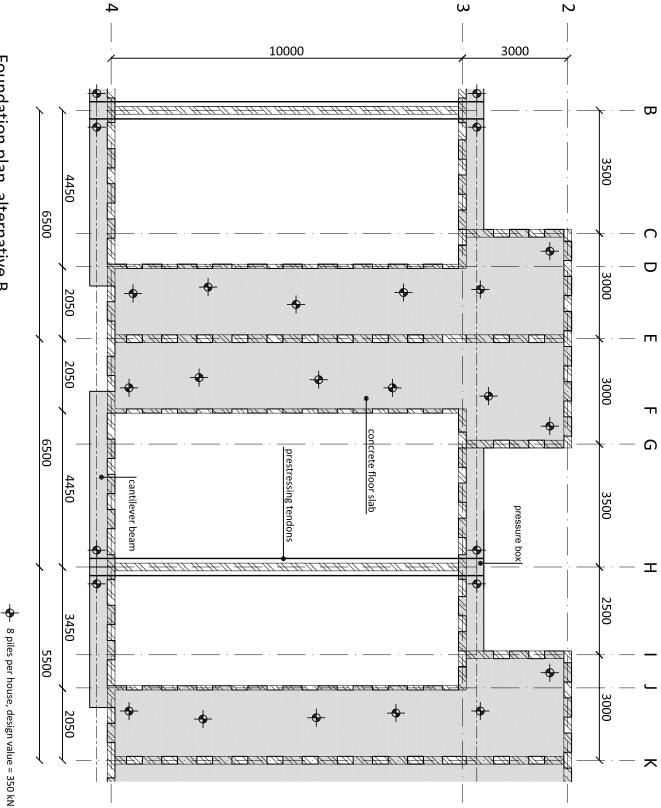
Alternative B, foundation repair plan Marthinus Steynstraat 29-39 (by author).
